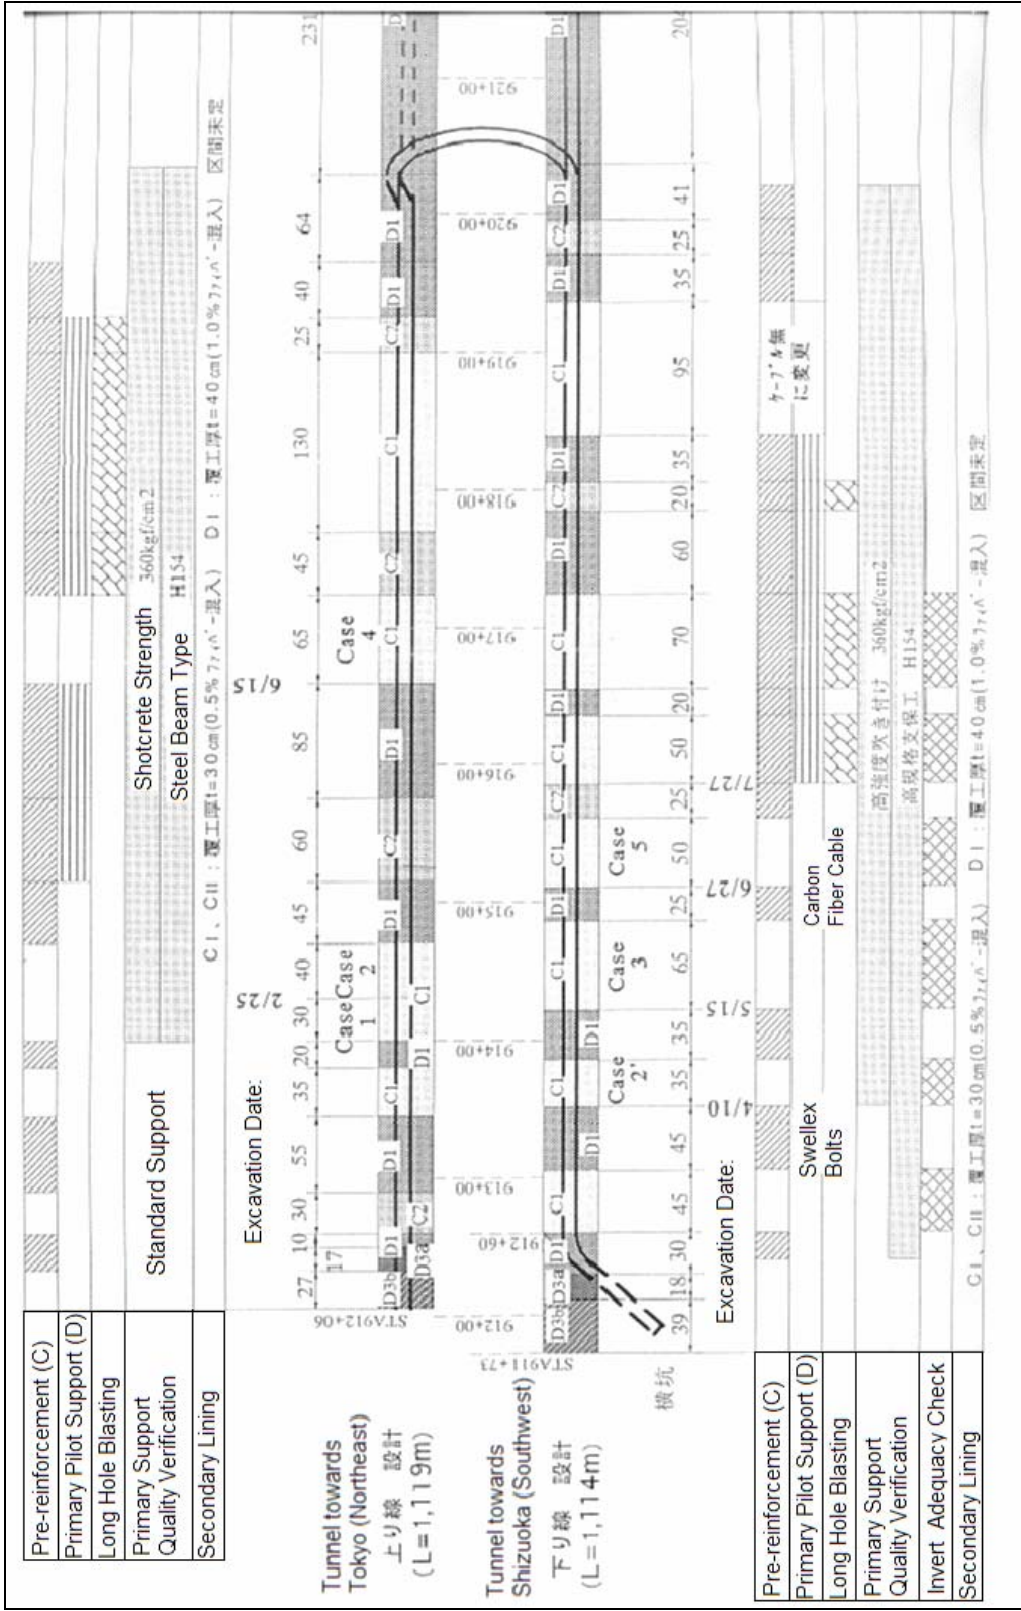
Worksite plan of Shimizu No.3 twin tunnels on Tomei II Expressway, Japan. Rock mass quality grading and support system (After Japan Highways,1998).
